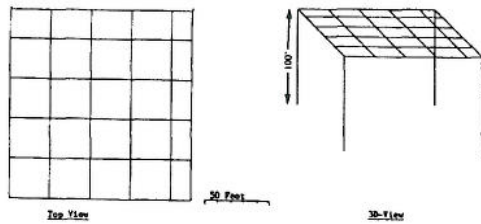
West Davenport Substation Grid; Final Stage of its Construction
